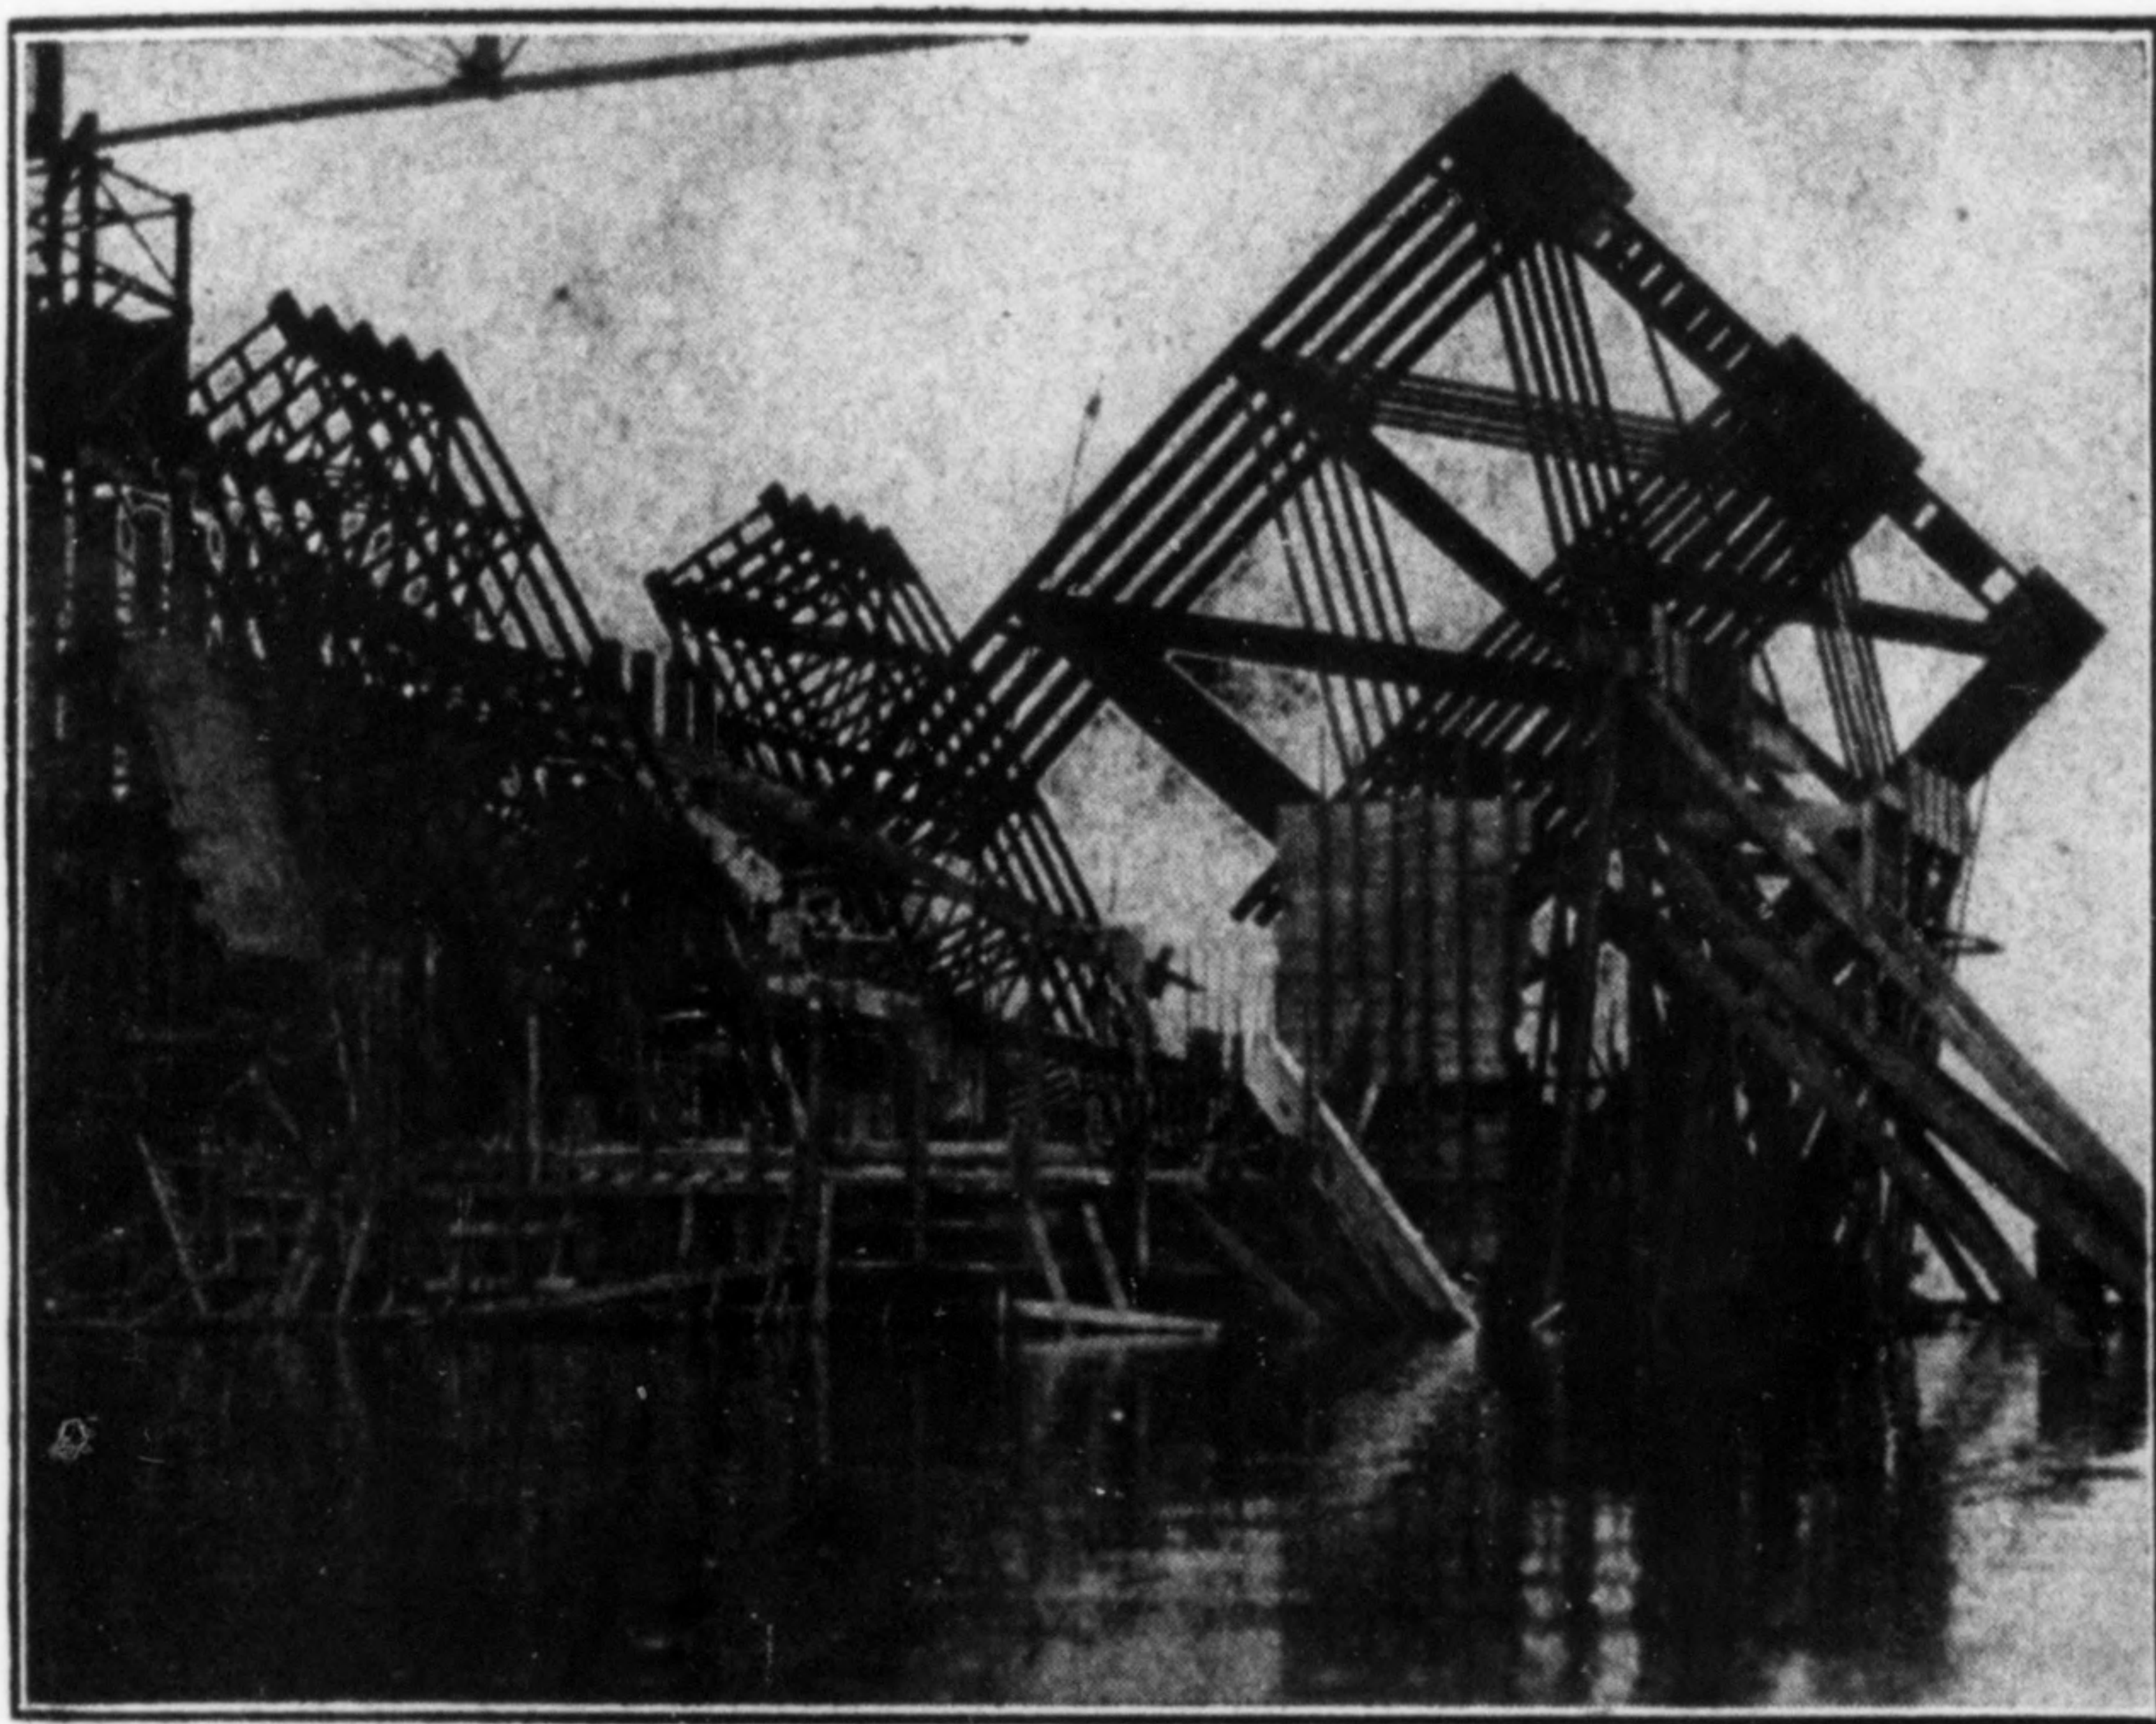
RIB REINFORCEMENT AND COMPLETED PIER WITH RIB SECTIONS
